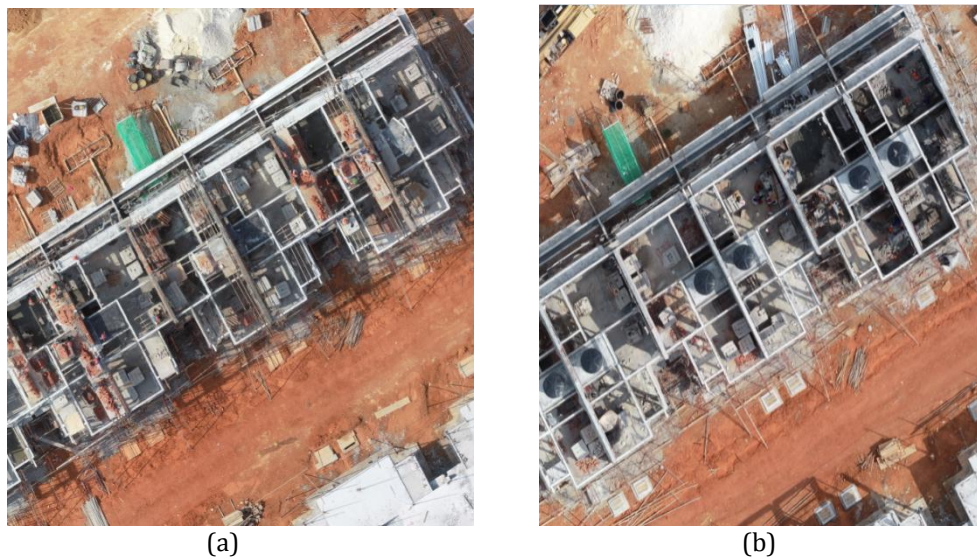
The image of Block 1 in (a) week one (no progress yet) and (b) week two, brickworks complete after one week for upper roof beams and water tank slab, shows that 8 unit houses have been installed with water tanks.
